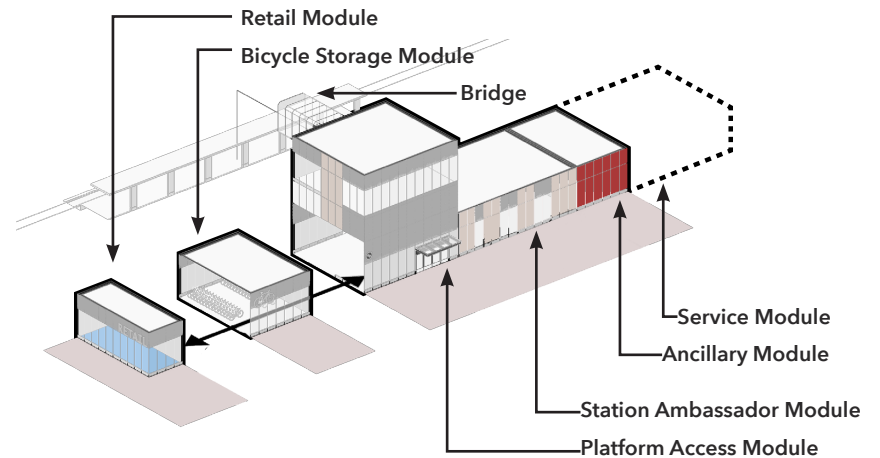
Planning Diagram of a staffed Station Building, illustrating Bridge Platform Access.
